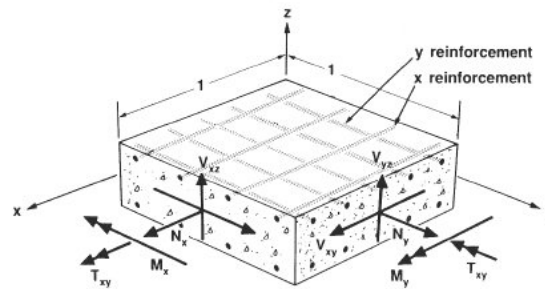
Reinforced concrete panel with complete loading scenario[16]
